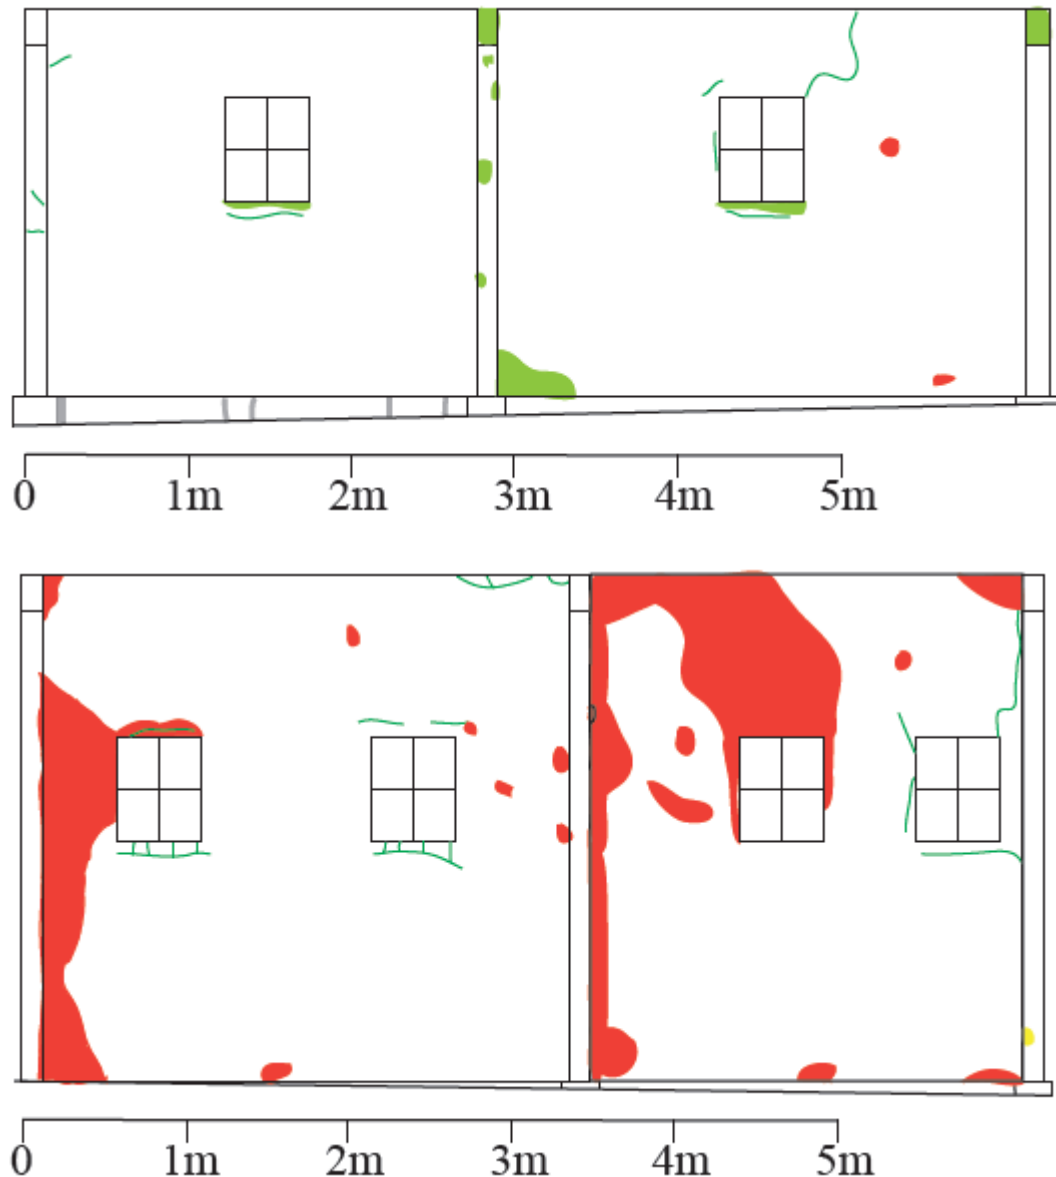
Salt efflorescences on the internal wall of a heated room in Building 25
